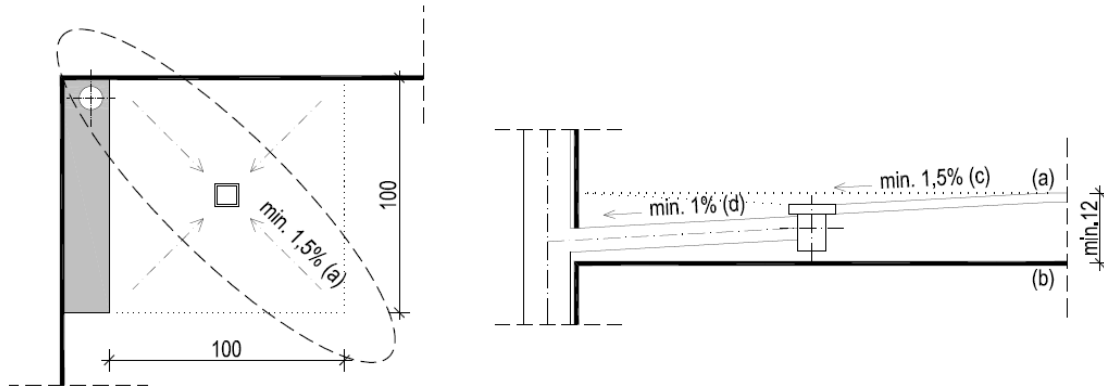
Shower place floor layout and section along the slope direction. (a) floor level; (b) upper level of loadbearing construction; (c) slope of the floor; (d) slope of the connecting tube with diameter 50 mm
